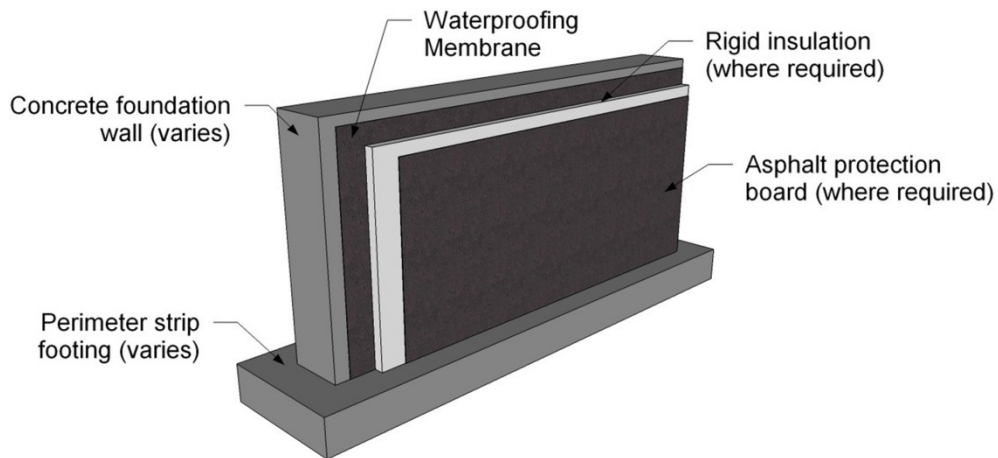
Typical Components of Perimeter Footings and Foundation Walls
